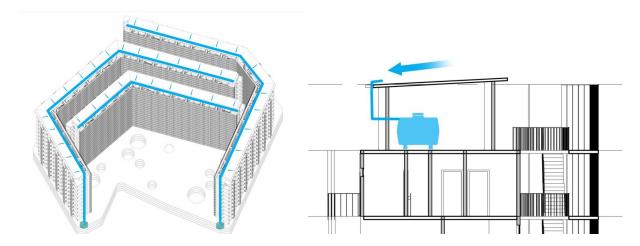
Rainwater Harvesting System for the Proposed Alternate Design
